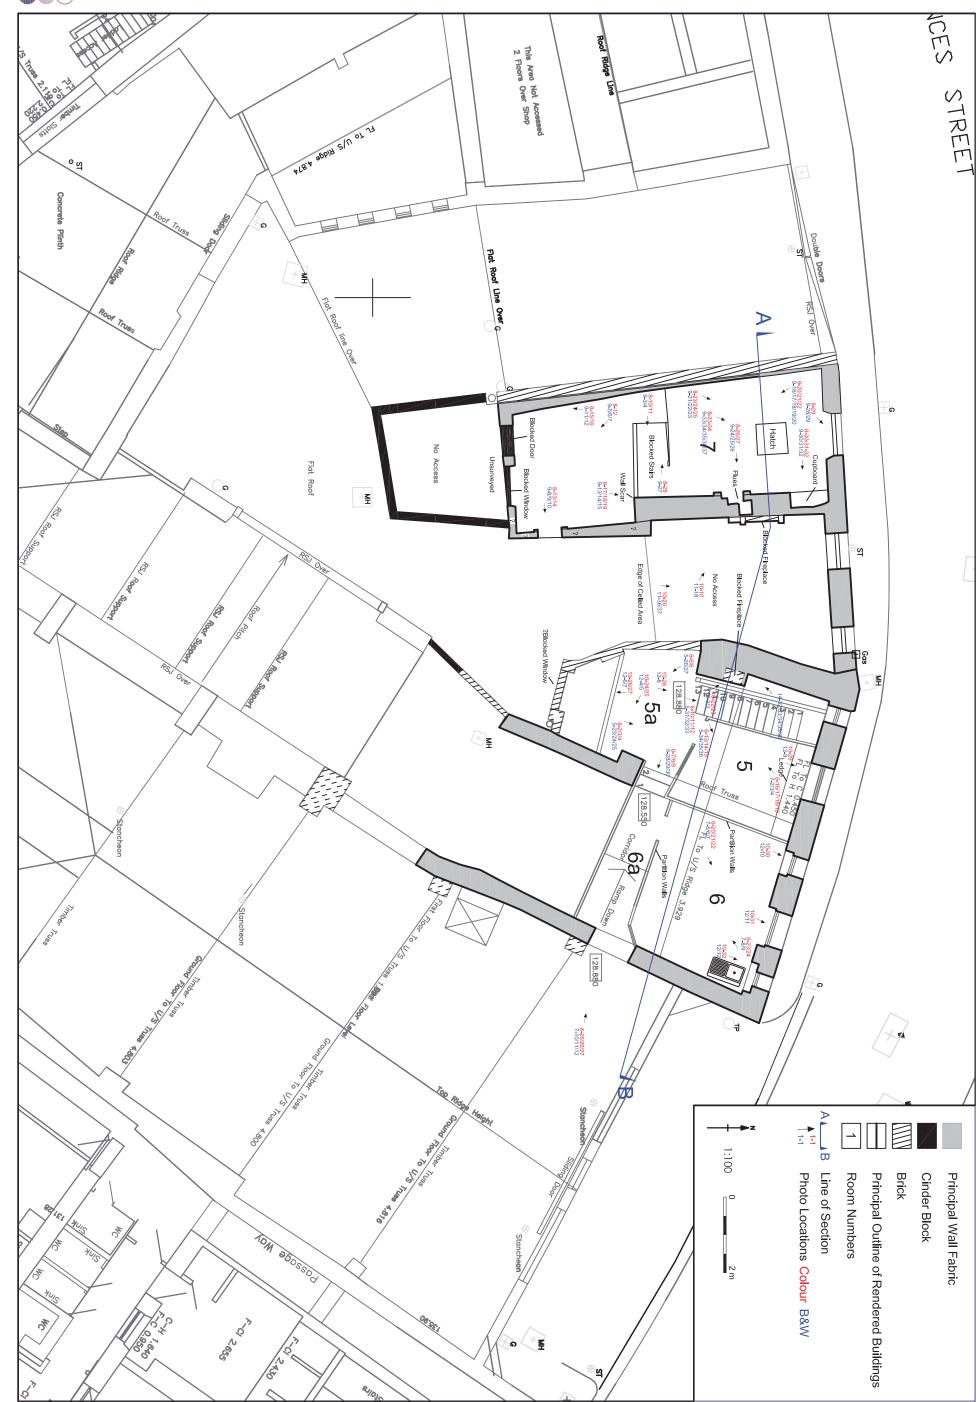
First Floor Plan of Numbers 9-12 Princes Street
